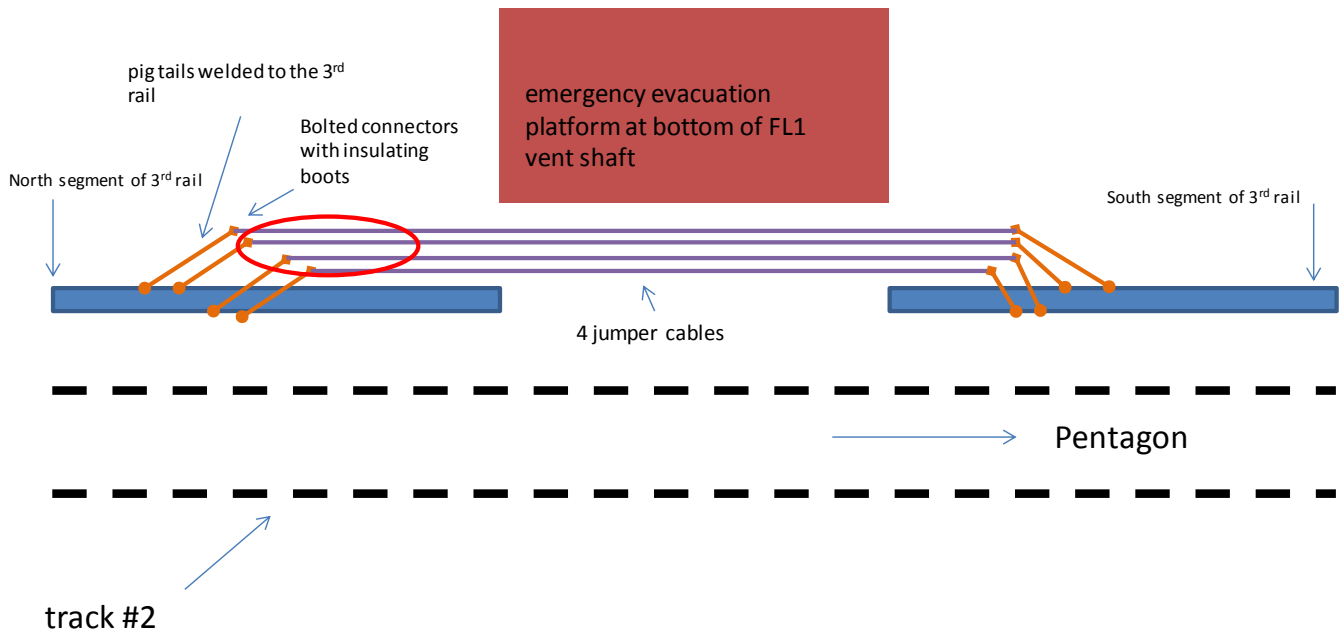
Diagram (plan view, not to scale) depicting jumper cable installation at the accident site. The area circled in red is where the majority of electrical arcing occurred.
